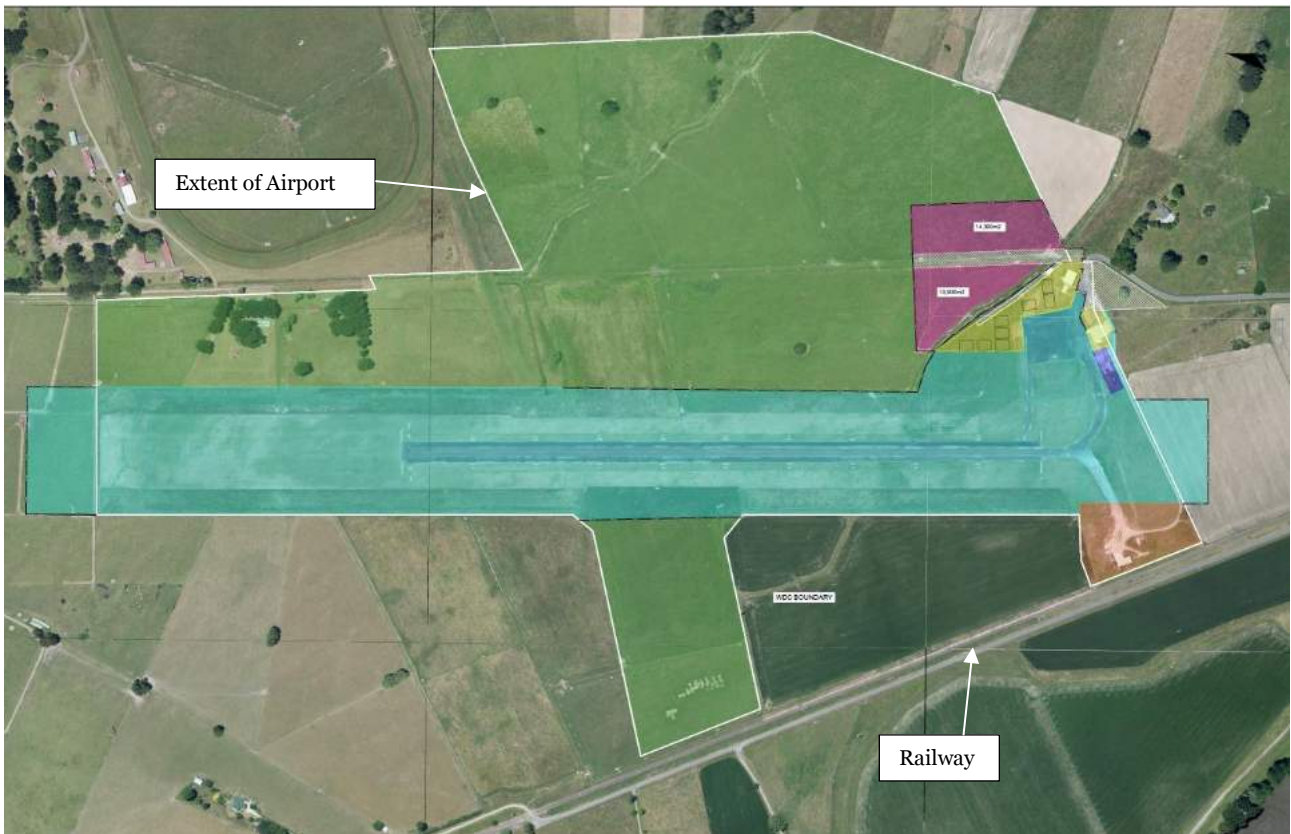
Airport plan Layout (see Appendix A for a larger version of the layout plan)
